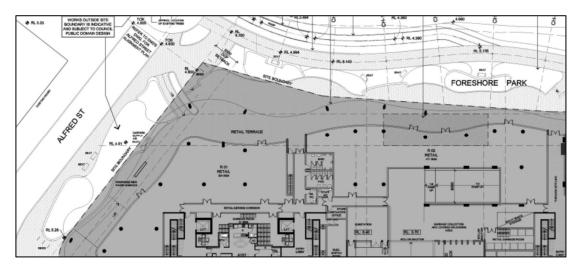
Ground Floor approved plan – KTA Architects dated 21/02/14
